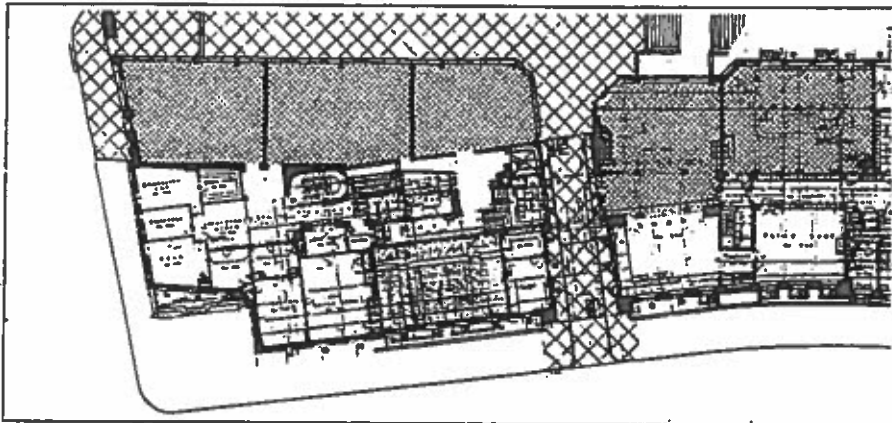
Concept floor plan extending College Building studios into a renovated Bank Building
